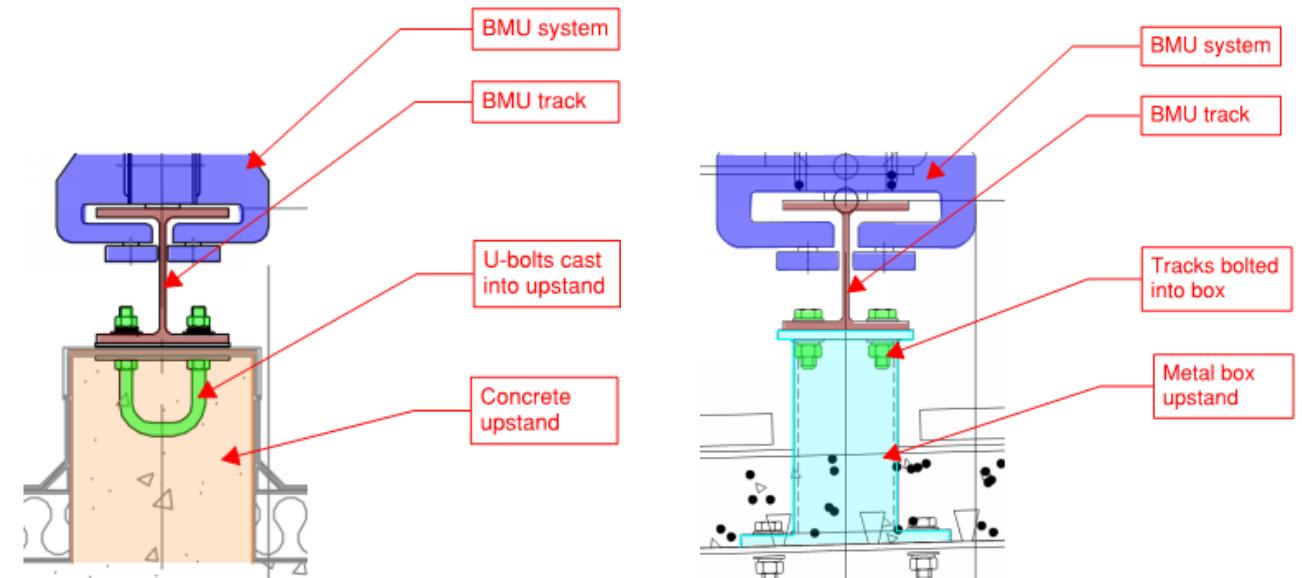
Typical upstand detail - concrete upstands cast into the slab (left), metal box upstand bolted to the structural frame (right)
